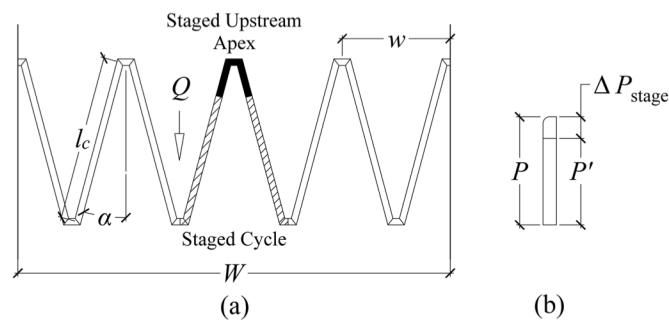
Geometric variables of labyrinth and staged labyrinth weirs in (a) plan and (b) elevation view
